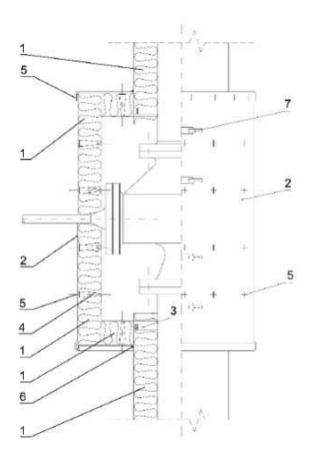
Insulation of a flanged valve on vertical pipework. 1 - Insulation mat, 2 - Insulation jacket, 3 - Supporting structure, 4 - Insulation fastener, 5 - Tube rivet with fastening core, 6 - Sealing with silicone putty, 7 - Cap lock.
